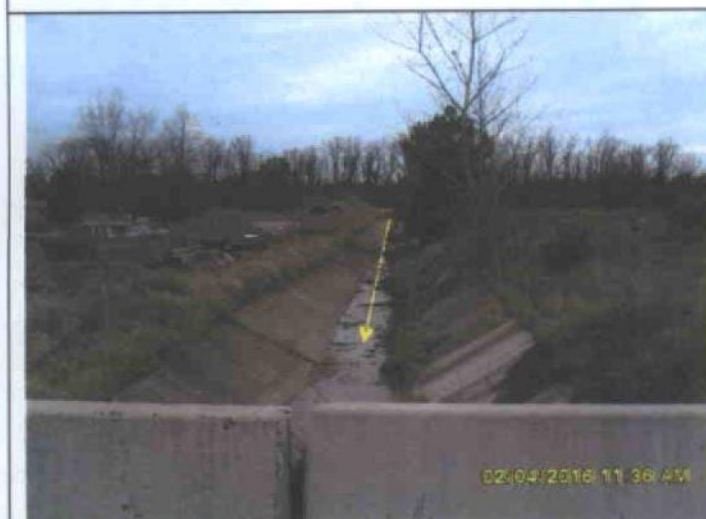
Concrete drainage ditch adjacent to coal storage area. Stormwater flow is in the direction of the arrow.
